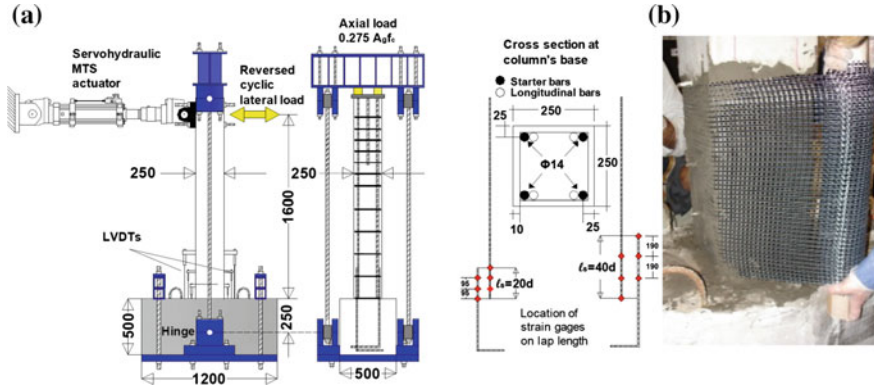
a Schematic of test setup and cross section of the columns. b Application of a TRM jacket
